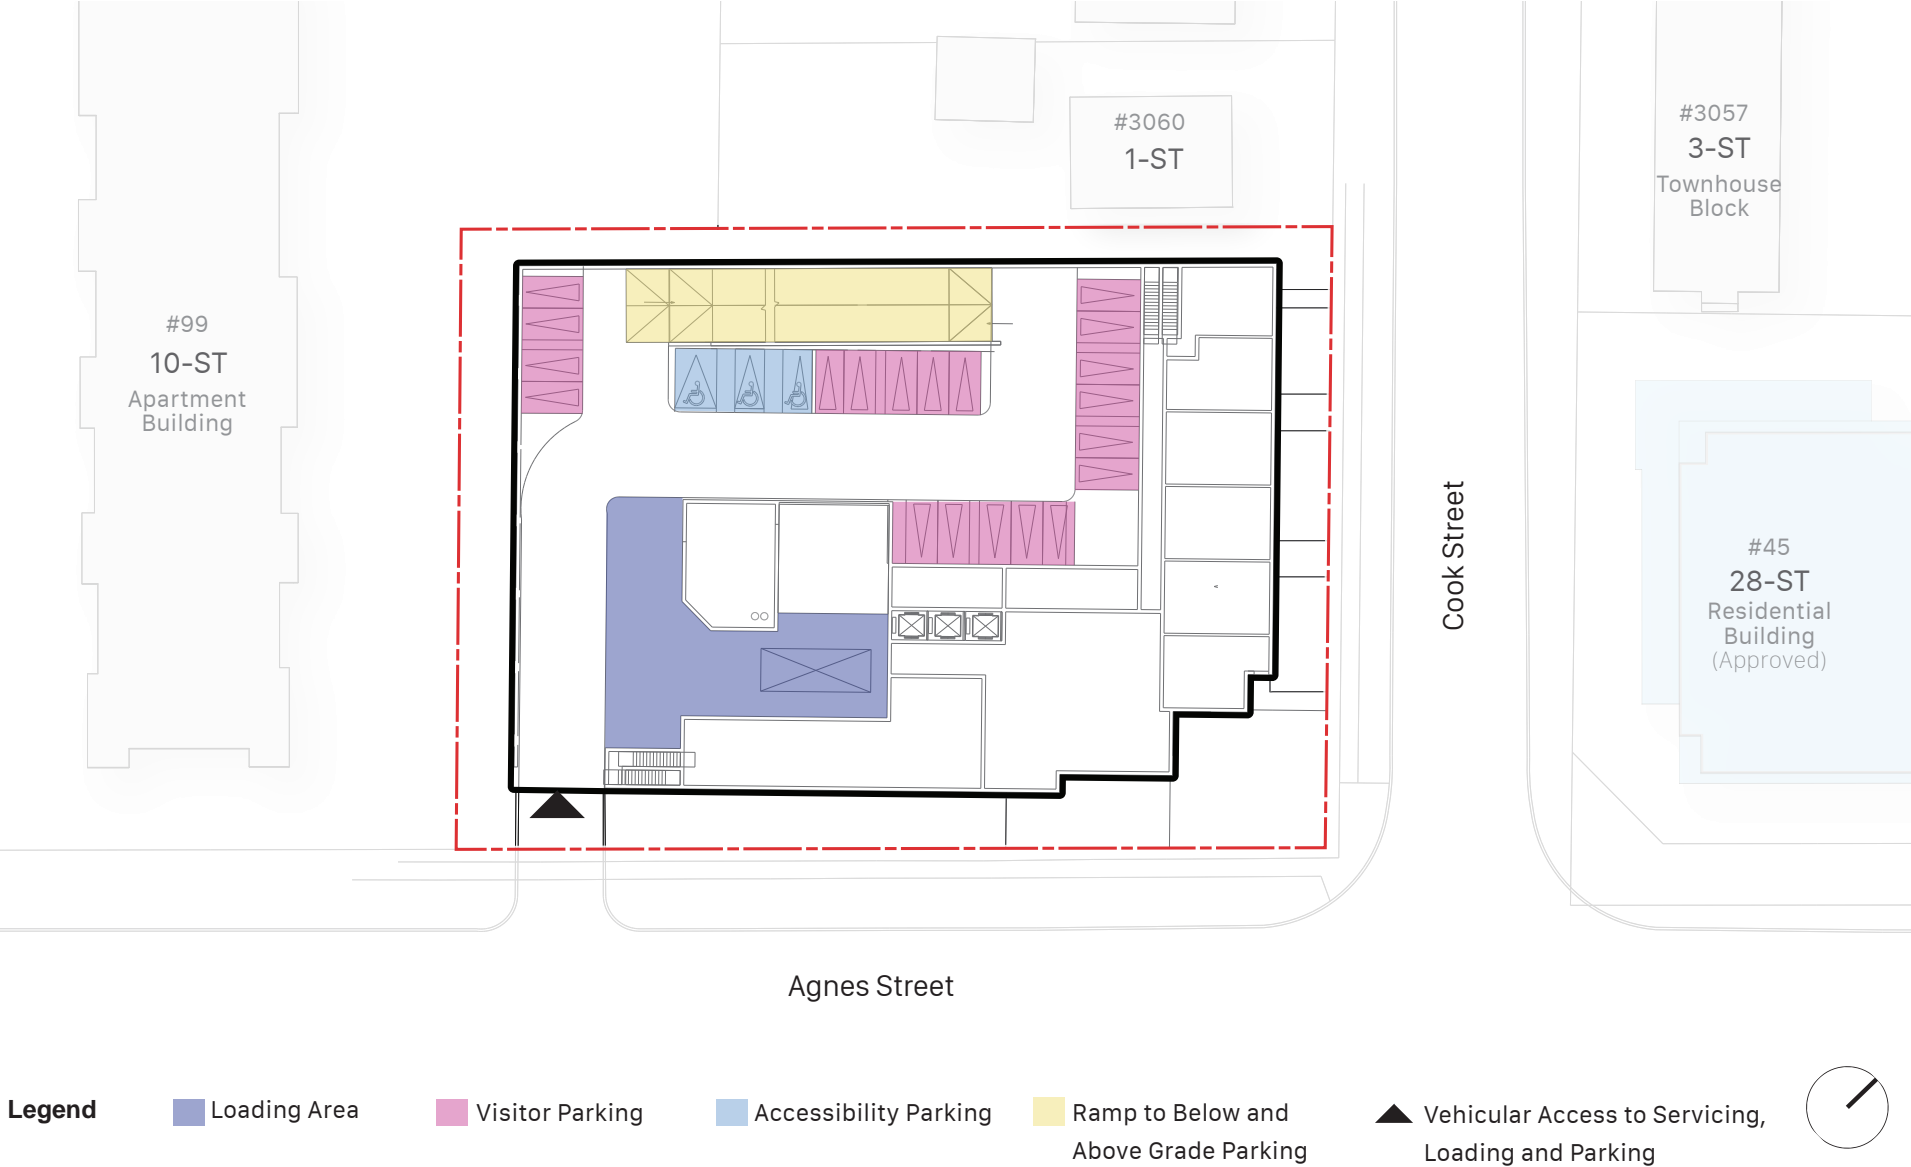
Vehicular Access, Parking, Loading and Servicing Areas
